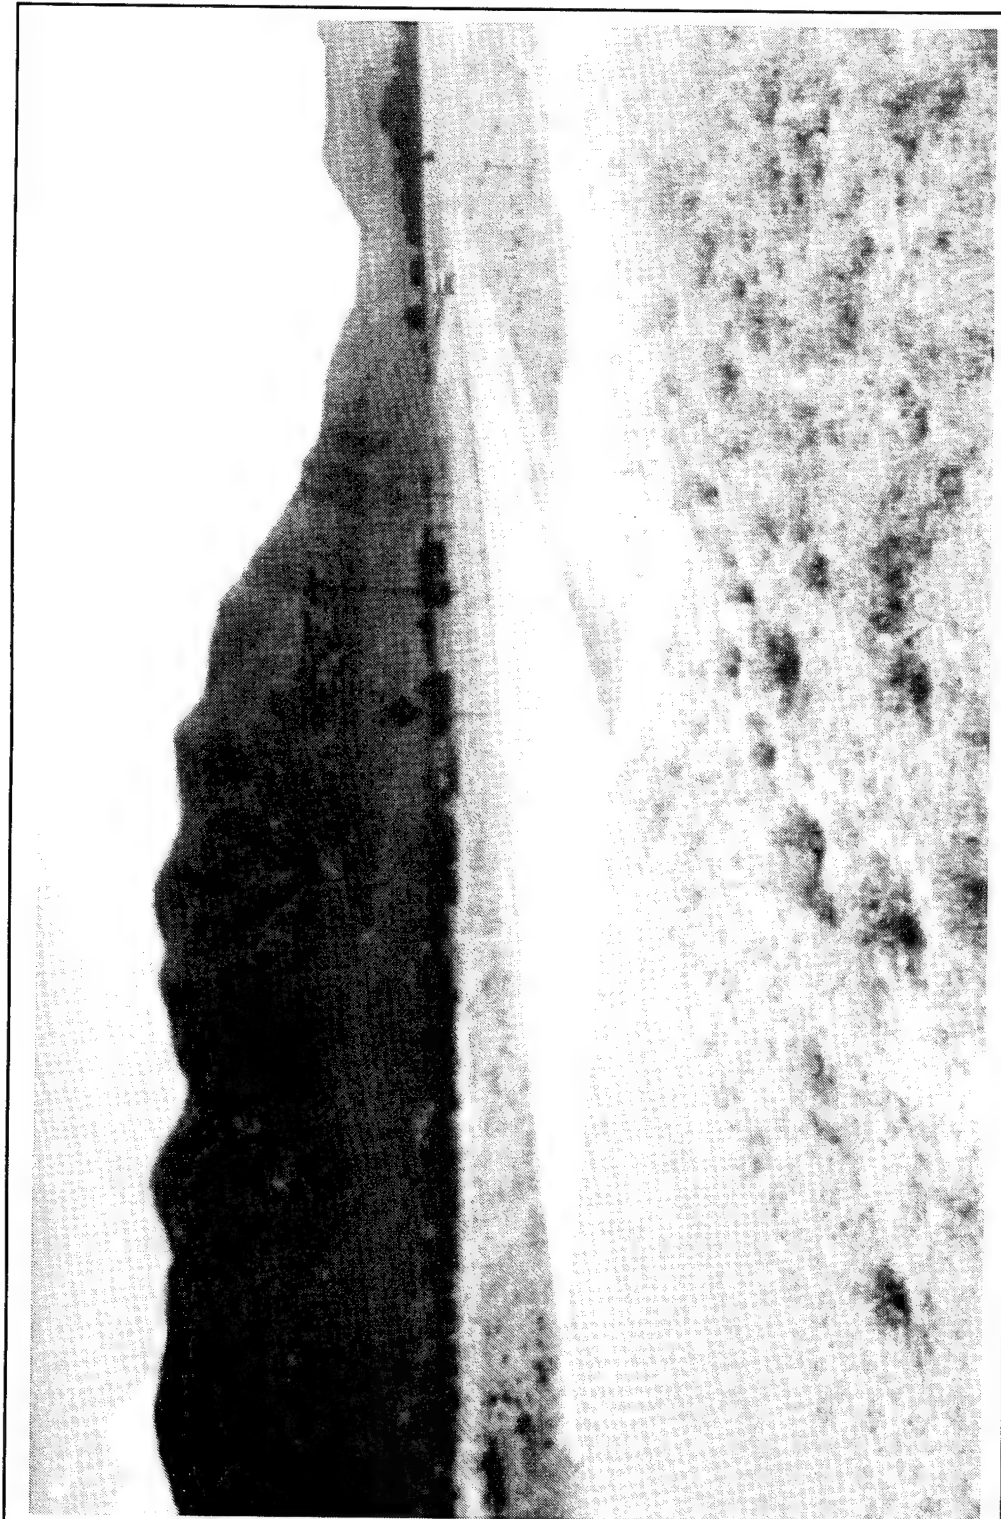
Simulated view: bridge installed to facilitate emergency vehicle passage.
